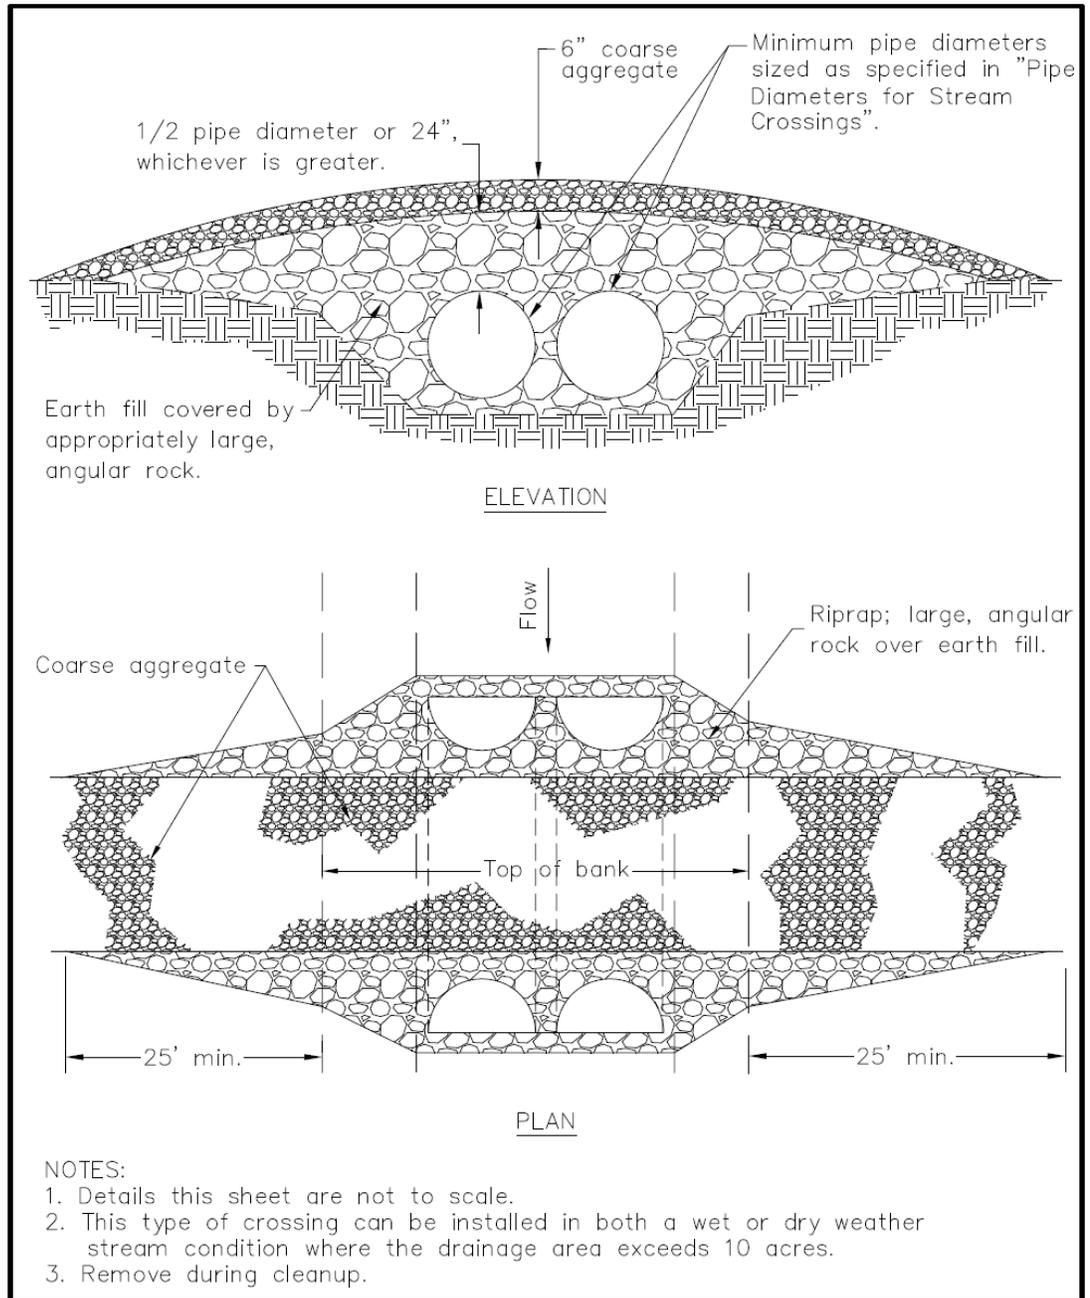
Typical Temporary Culvert Stream Crossing
